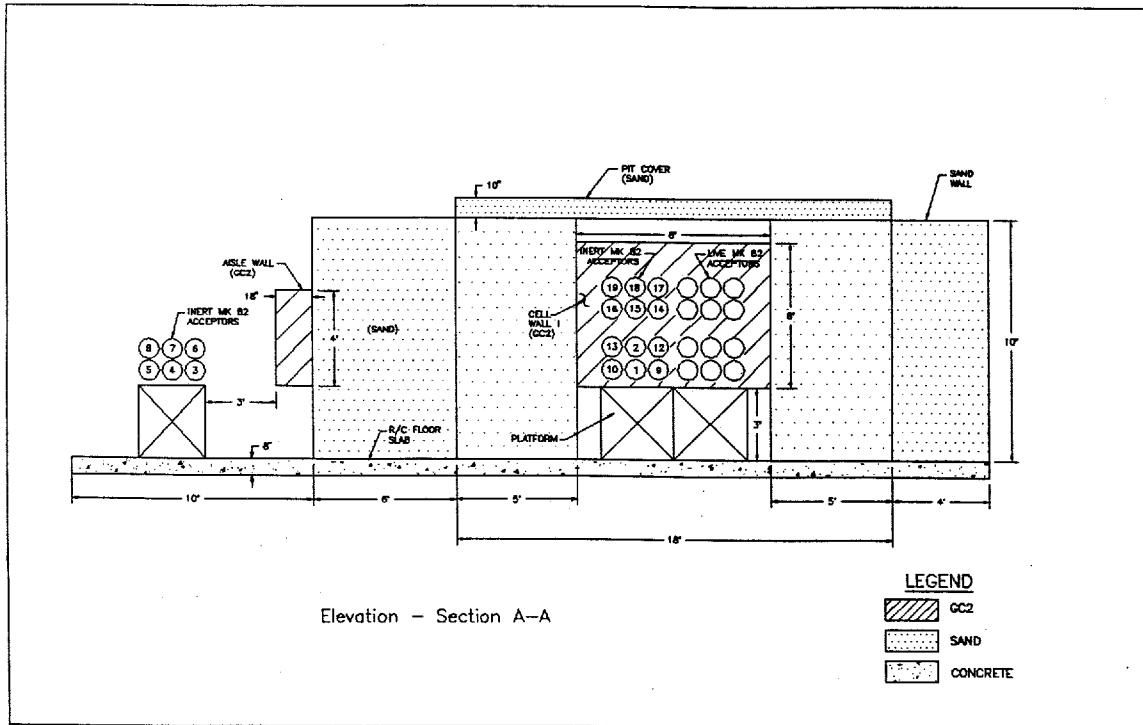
HPM Full Scale Cell Wall Test #2 - Test Setup.
